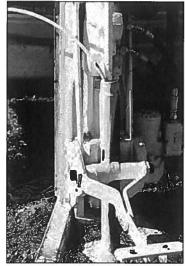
A grout machine and flexible tubing allow bottomup grouting as the outer casing is retrieved.
